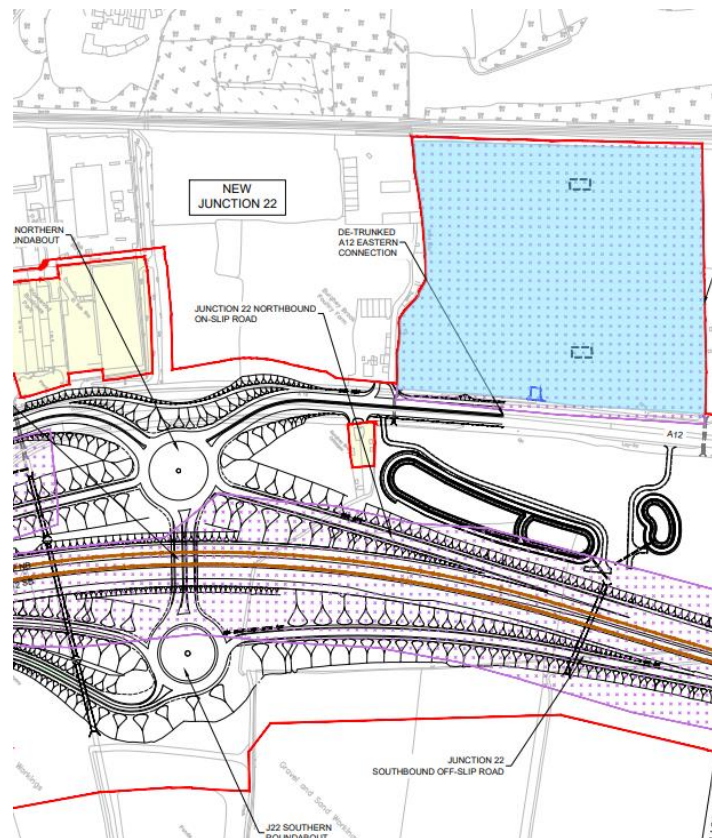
Sheet 10 of the Temporary works plan highlighting the location of the proposed J22 compound (shown by blue shading).
